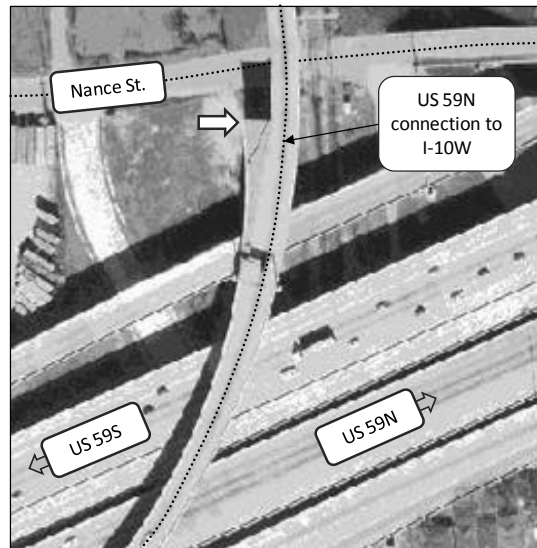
Location of Bent 15 within US 59N Connection Ramp to I-10W
